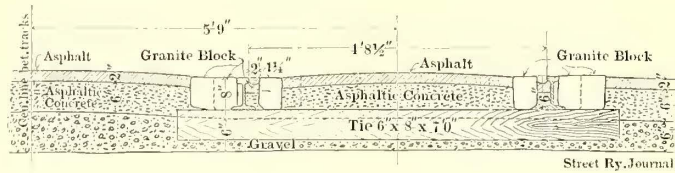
STANDARD TRACK CONSTRUCTION ON PAVED STREETS
